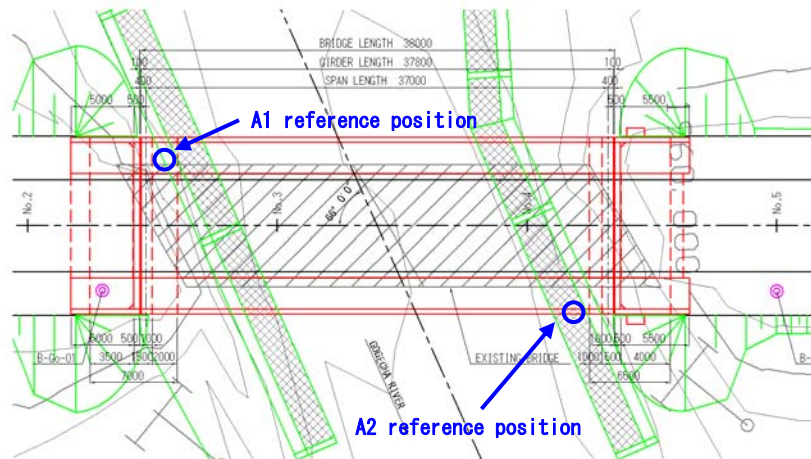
Reference points for the design of the new bridge (Gogecha Bridge)
